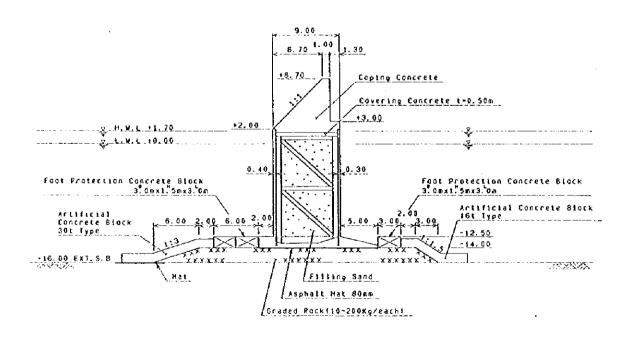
(2) Typical Cross Section of Breakwater 1 (Hybrid Caisson)
